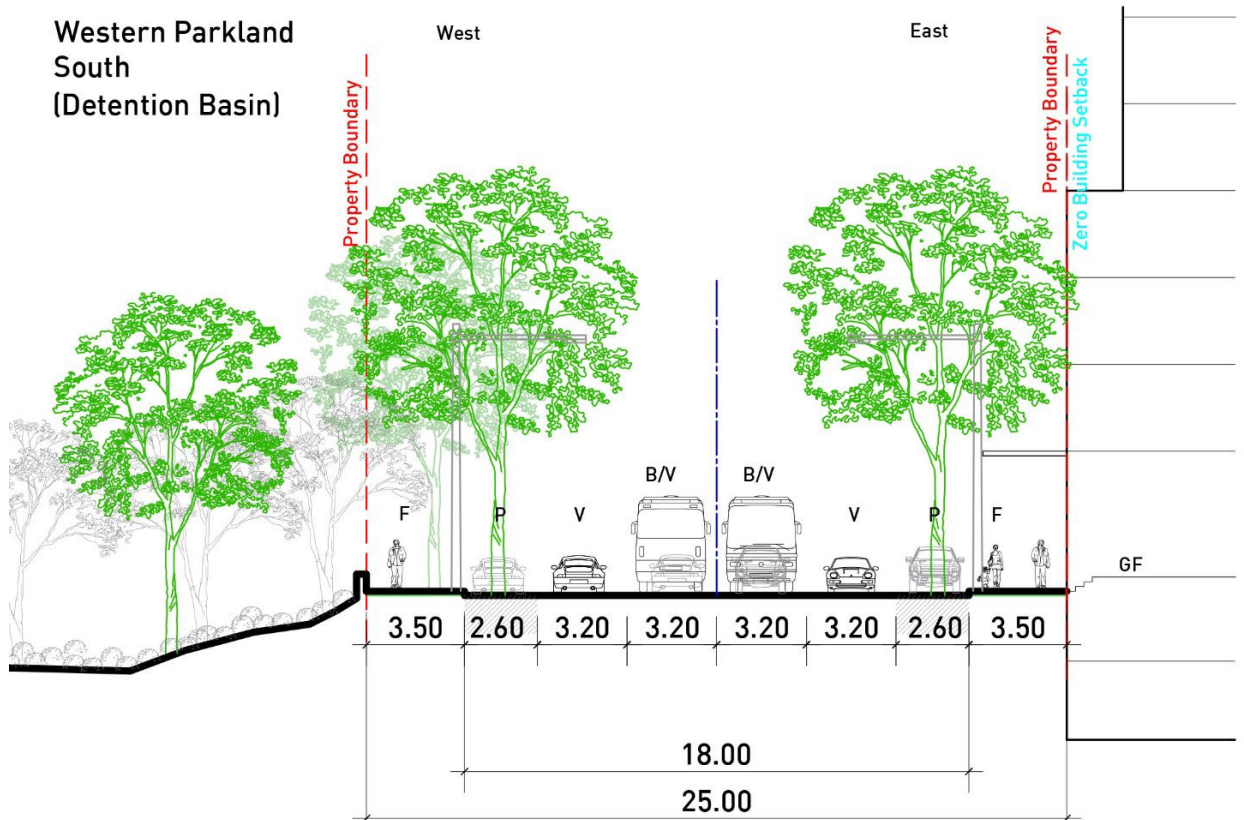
Type 1C Major Road Town Centre and Western Park Interface (NSR 2)
